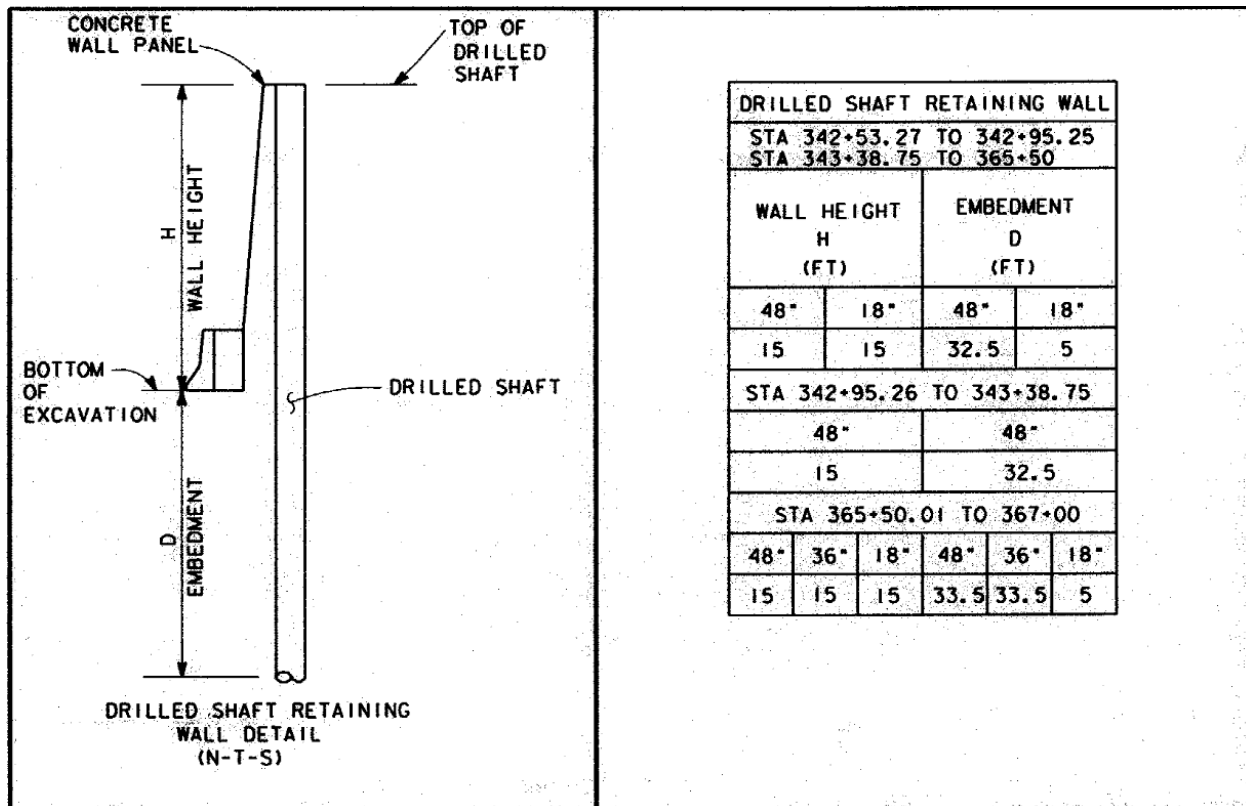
Details of drilled shafts for secant wall and sound wall foundation.
